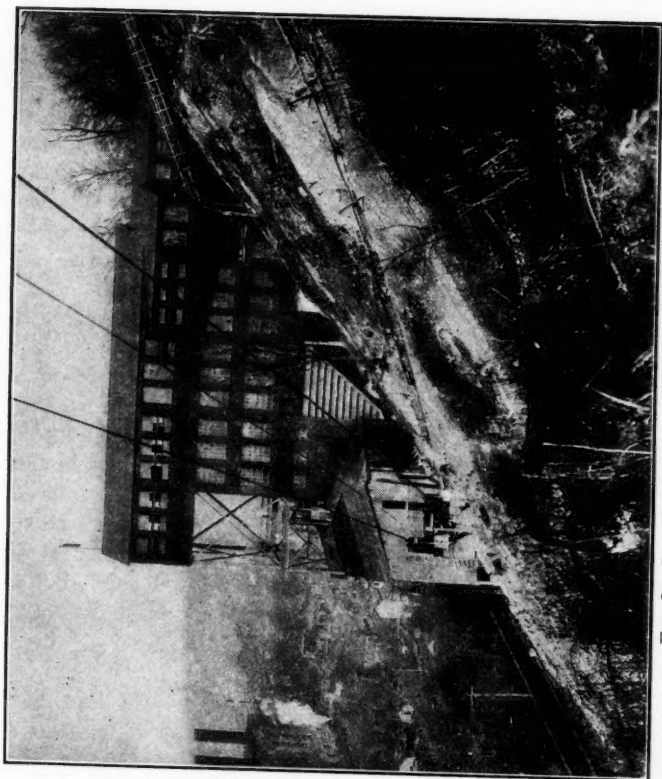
LOADING TERMINAL, MINE WASTE AT TIPPLE.
